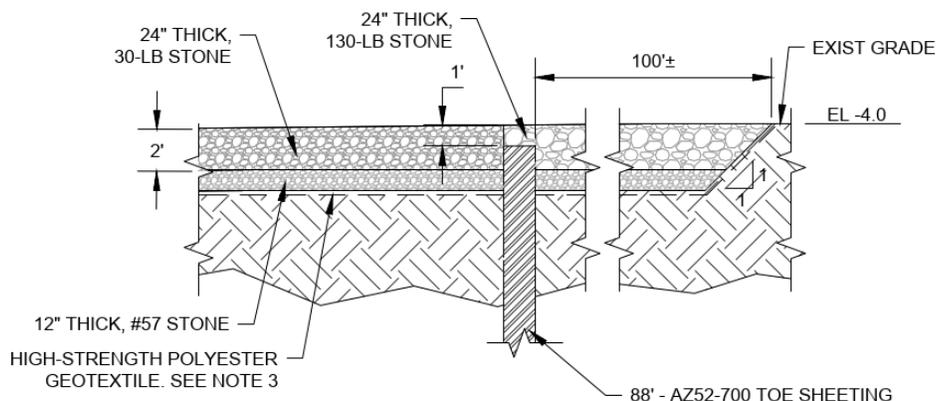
OTF Sheet Pile End Wall Detail
